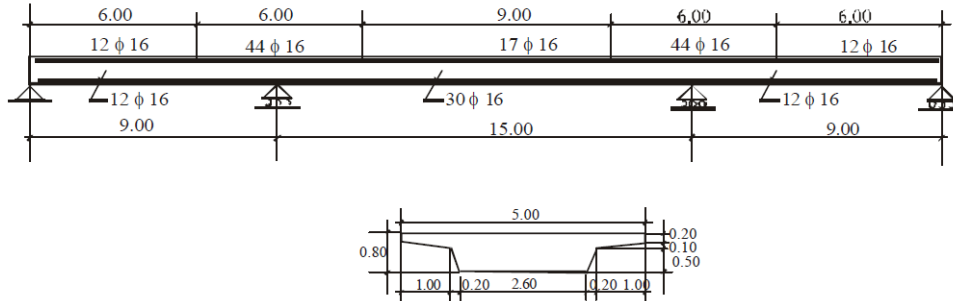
Elevation and cross section of the RC pedestrian bridge (Marí and Bairán 2008)
